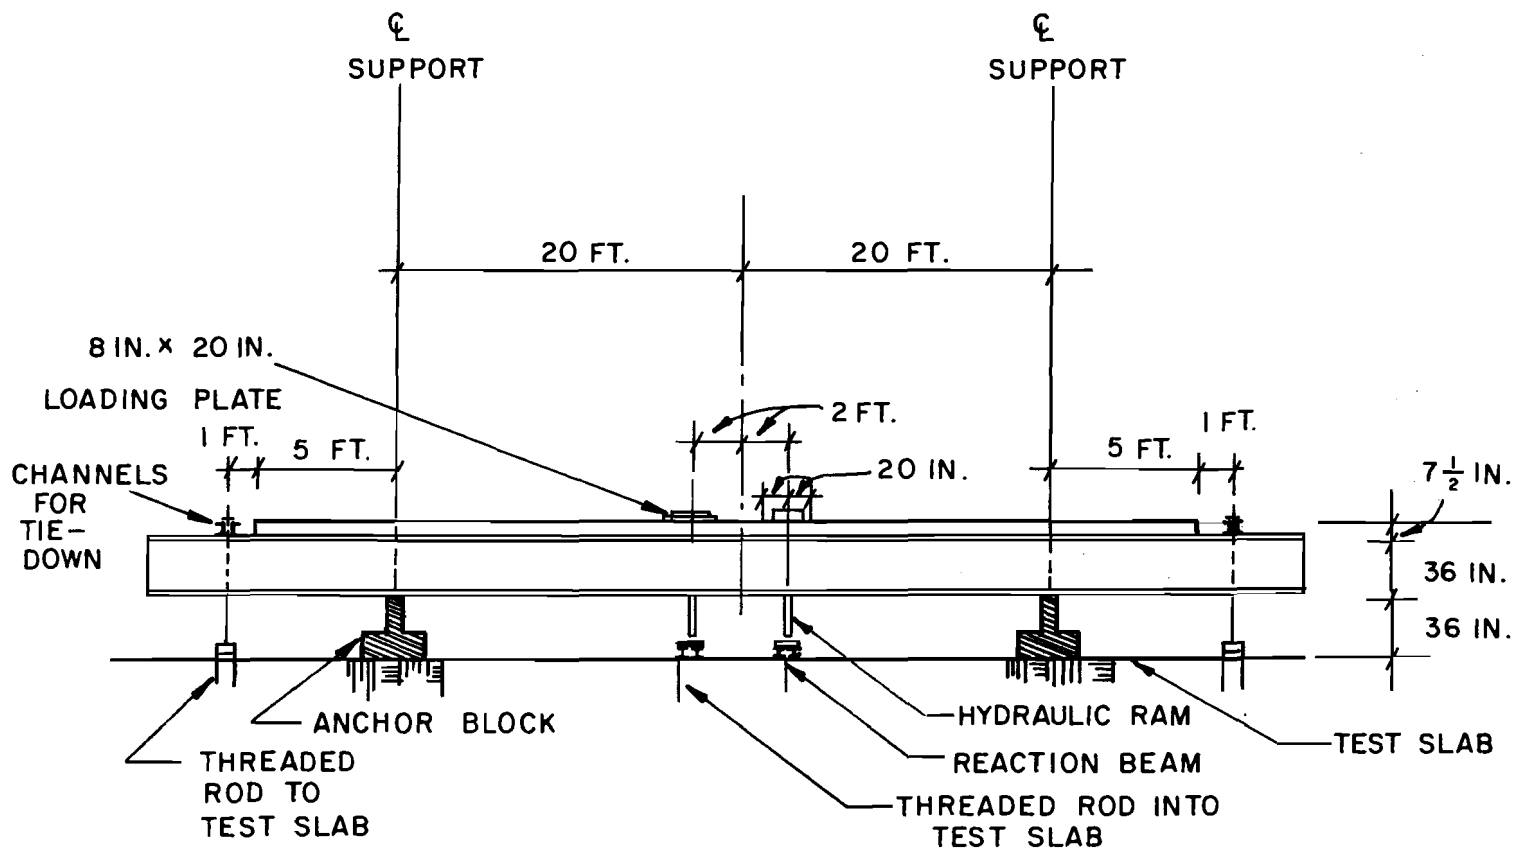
Elevation showing negative moment test setup, supports and loading conditions
